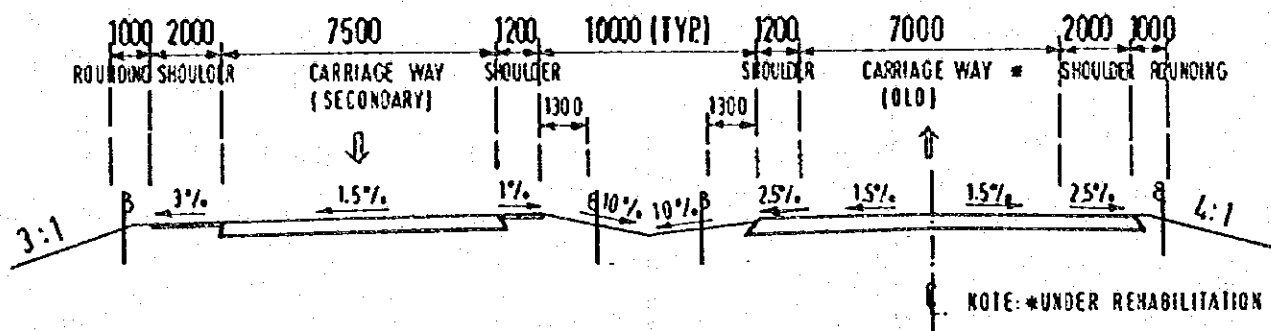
Typical Cross-section of Existing Batinah Highway
